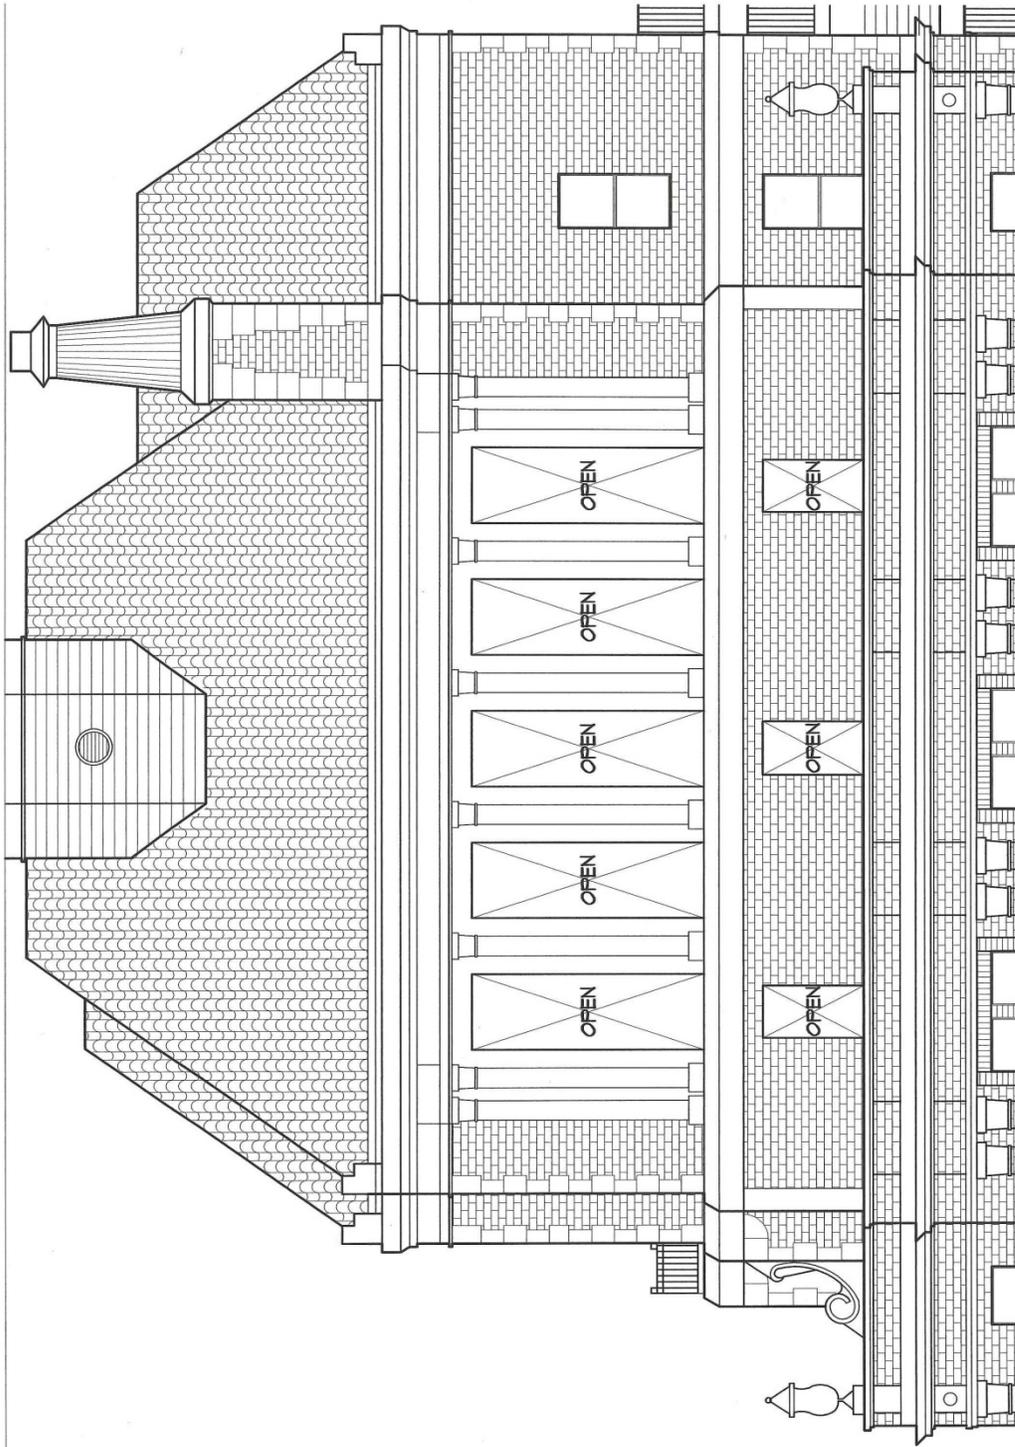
Exhibit G: Elevation Showing Exterior Wall to be Enclosed
